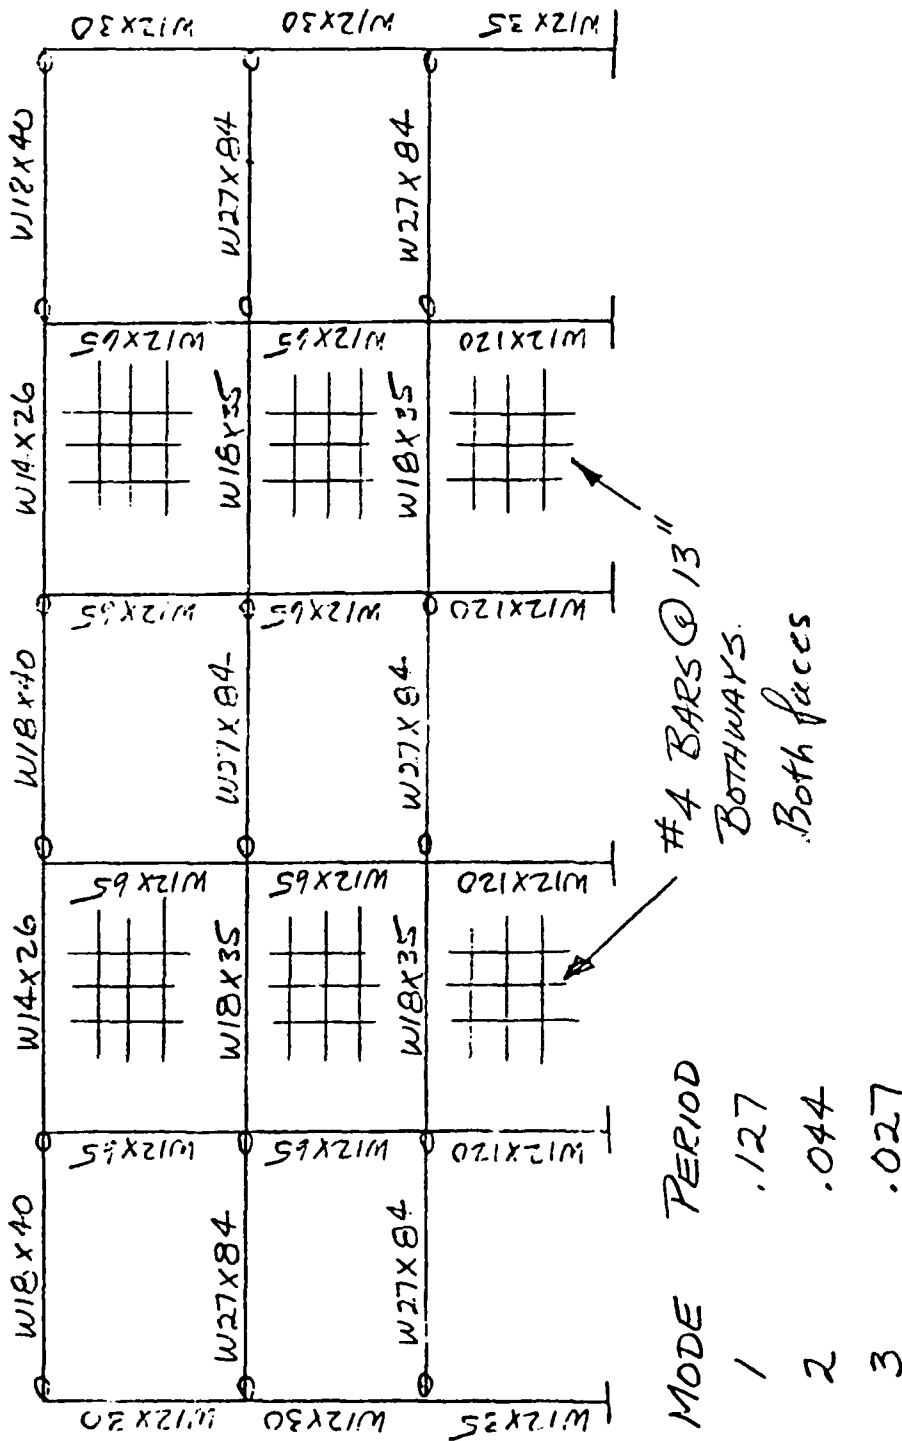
Shear wall frame, 0.30g base acceleration, 12-inch concrete wall.
